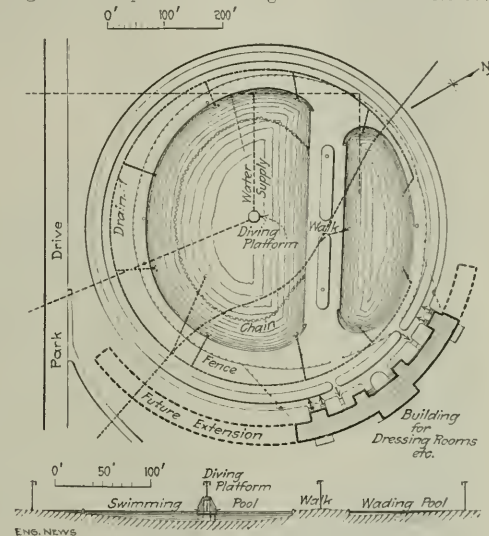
PLAN OF SWIMMING AND WADING POOL IN THE FAIR-GROUND PARK, ST. LOUIS, MO.
